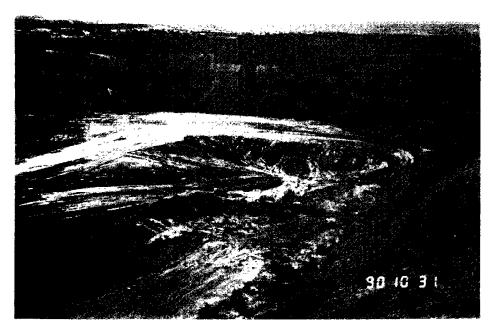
Backfilling open pit OP-35; top of fill is final elevation.
